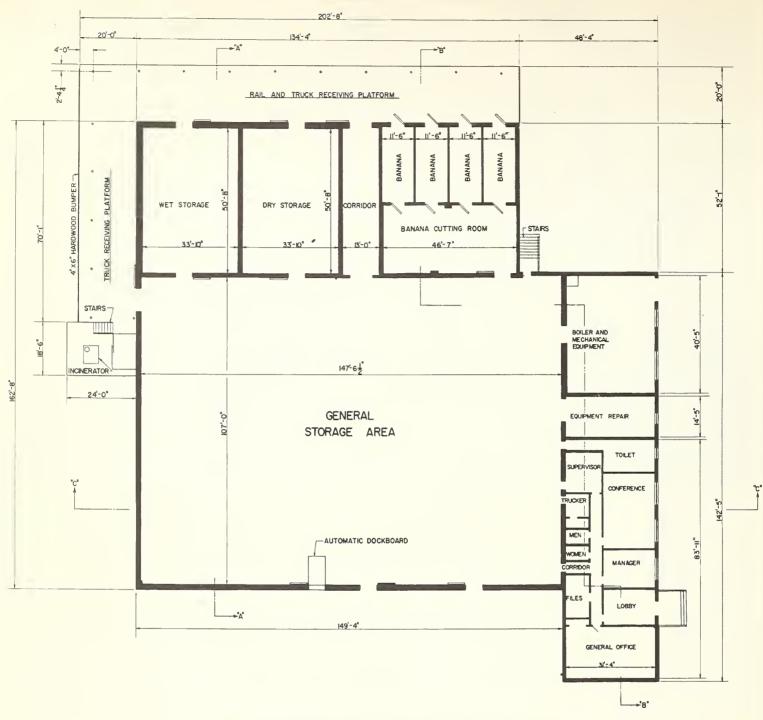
Floor plan of proposed warehouse in Cincinnati, Ohio.
